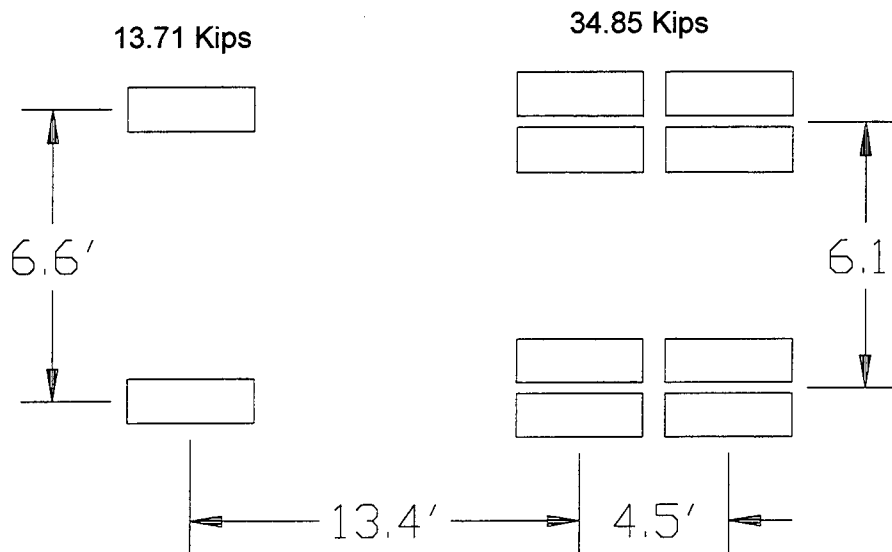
Load configuration of initial test truck – slab/girder bridge.
